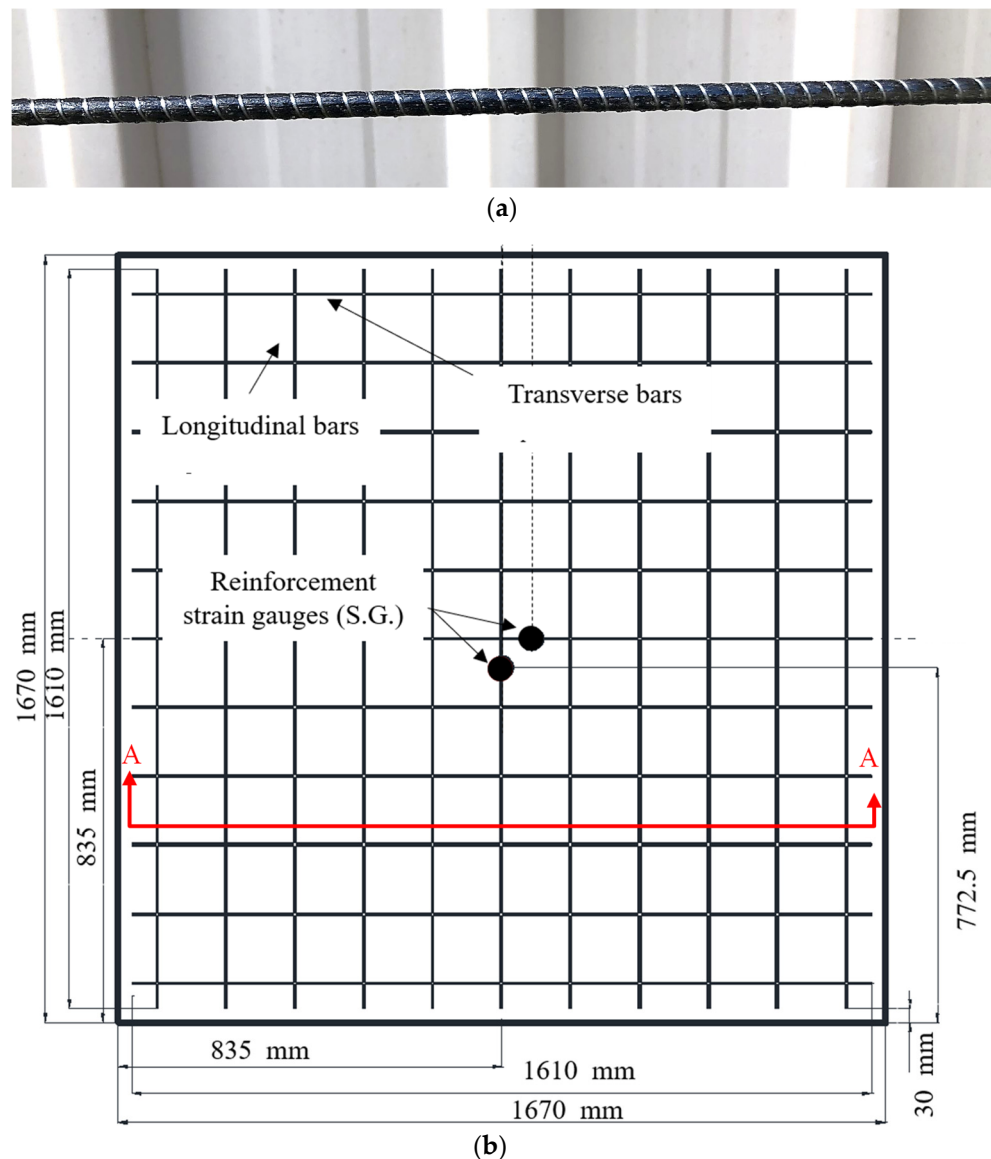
Reinforcement detailing, and the dimensions of the concrete slab. (a) deformed BFRP rebar; (b) reinforcement details.
